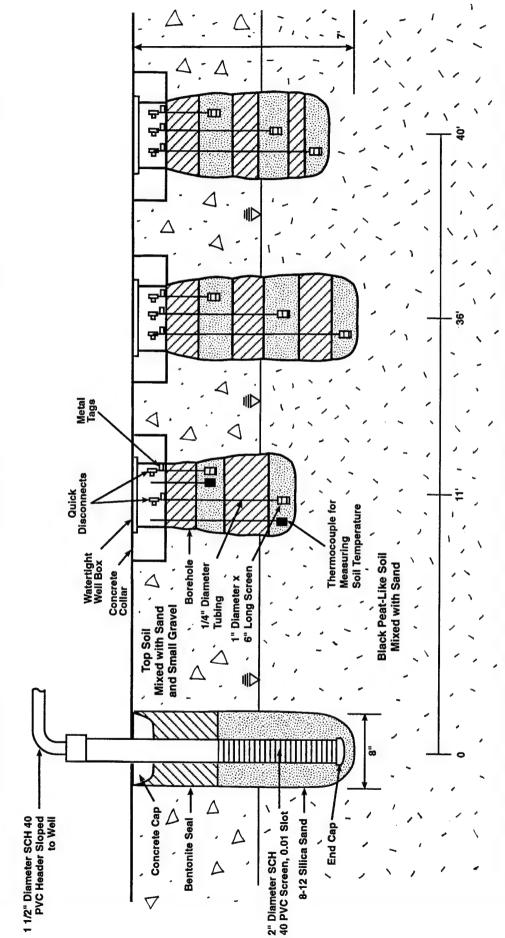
Cross Section of Vent Well and Monitoring Points at Building 1812 Showing Site Lithology and Construction Detail (not to scale)
